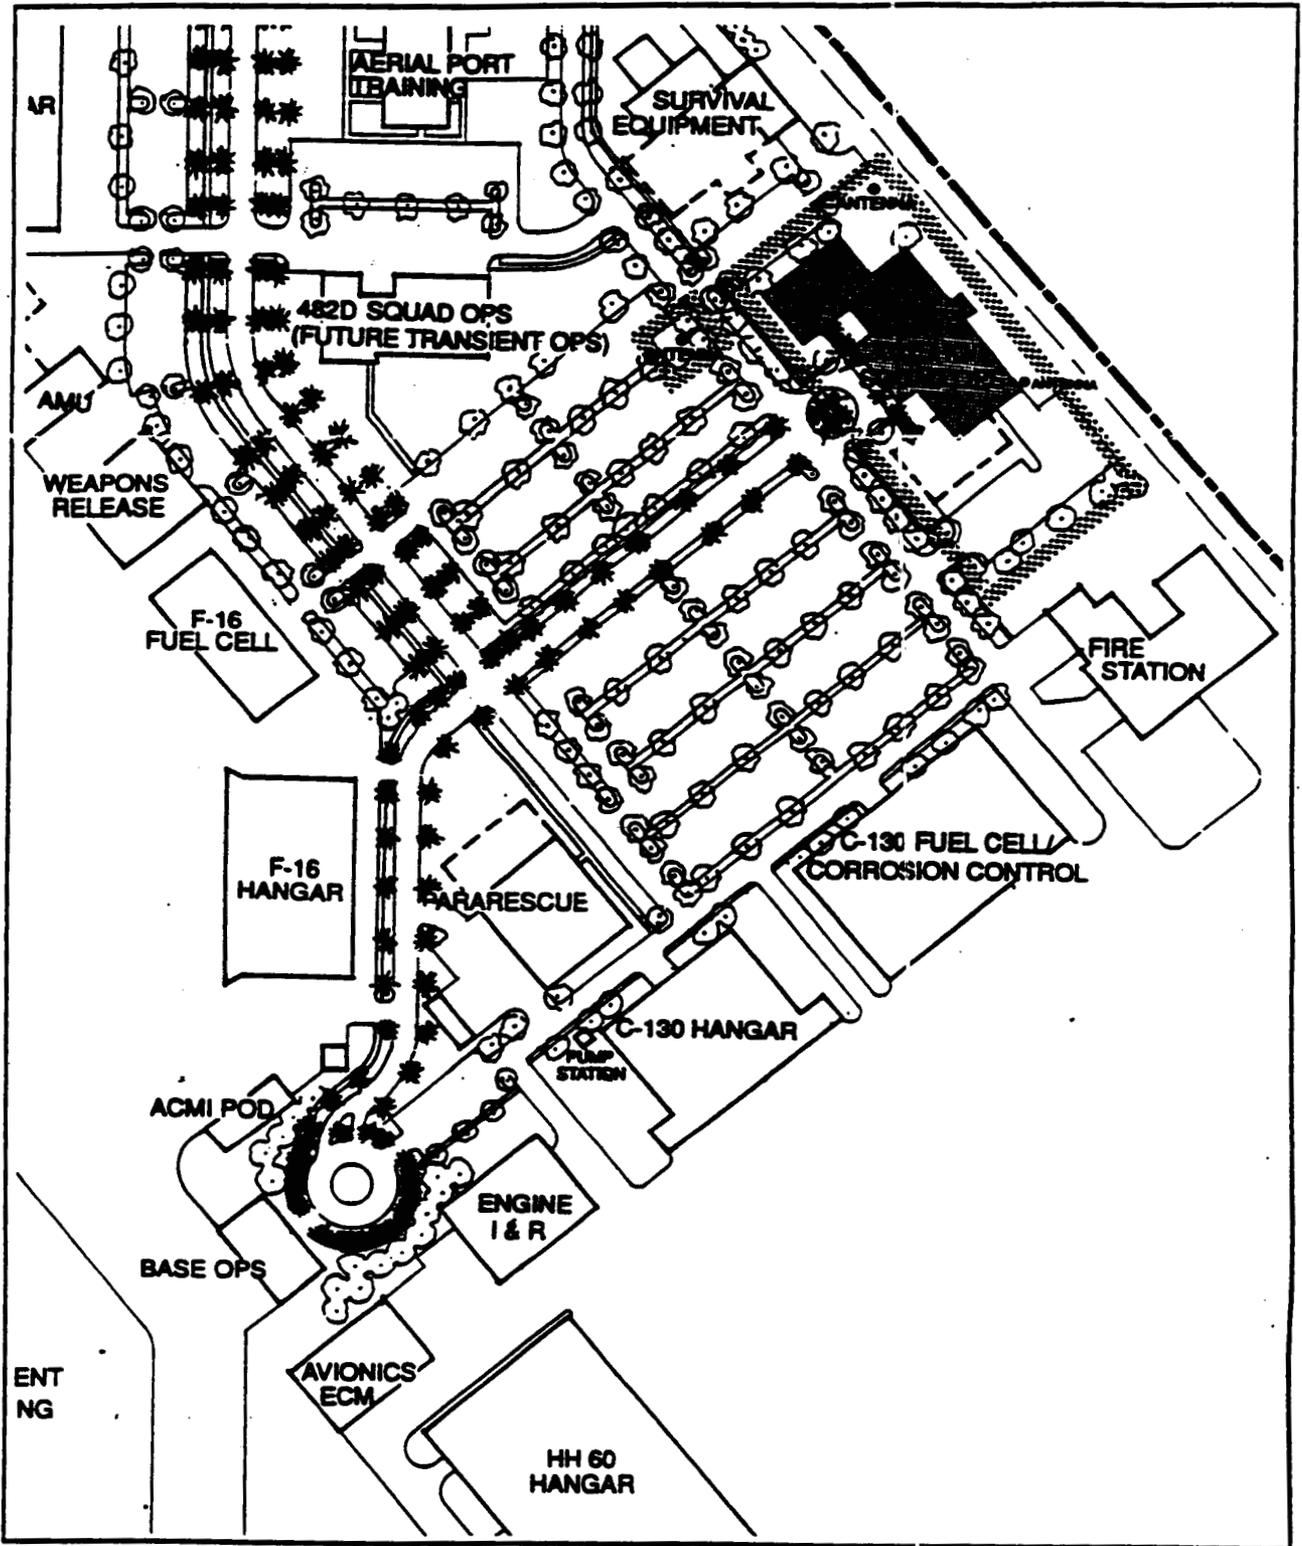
Area Development Plan for 301st Squad Ops
